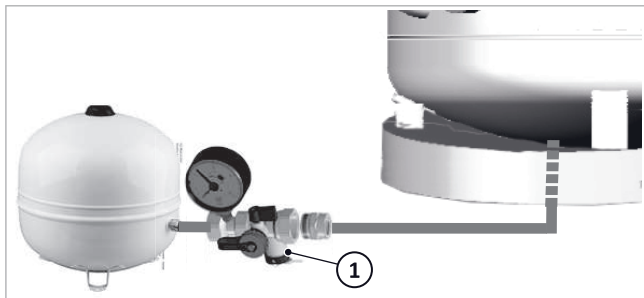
Boiler filling and emptying valve on the MEV connection group
